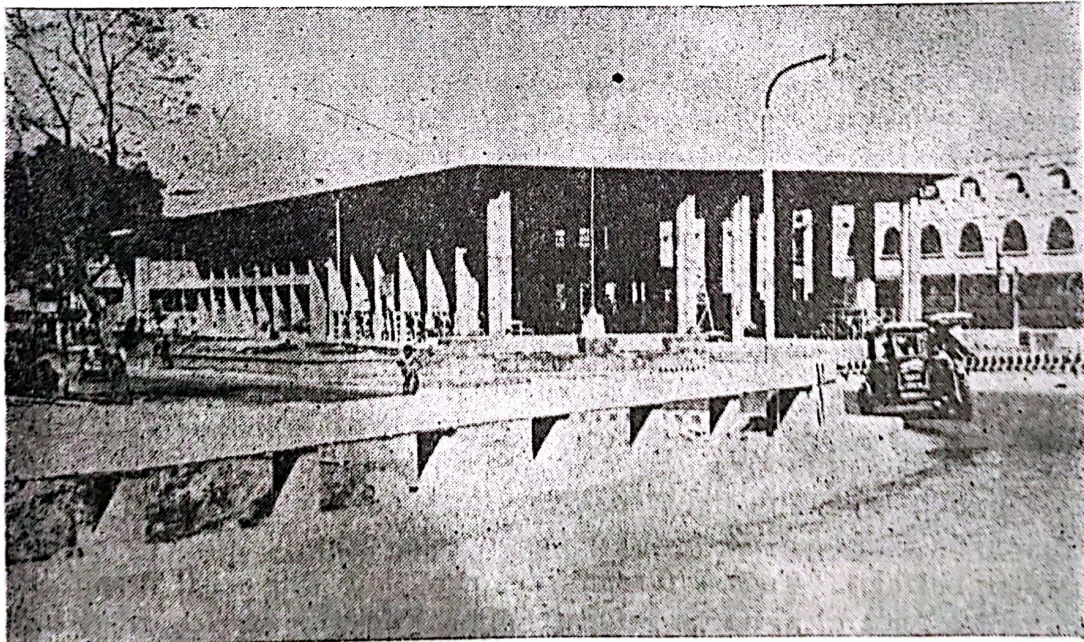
TOWN HALL AND CONCRETE-ROOFED OPEN-AIR AUDITORIUM IN THE TOWN OF BATAc, PROVINCE OF ILOCOS NORTE.
